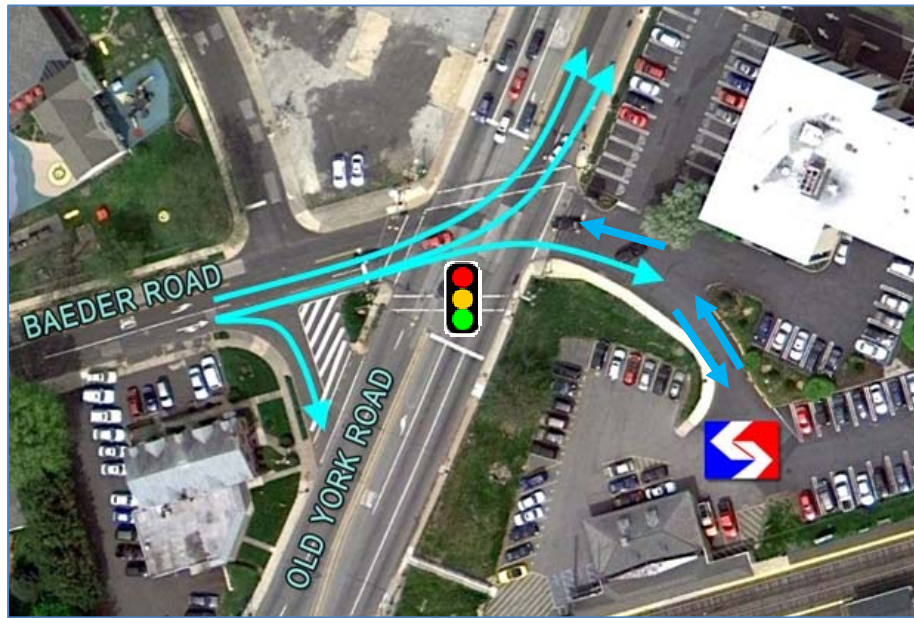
Old York Road and Baeder Road Improvements
